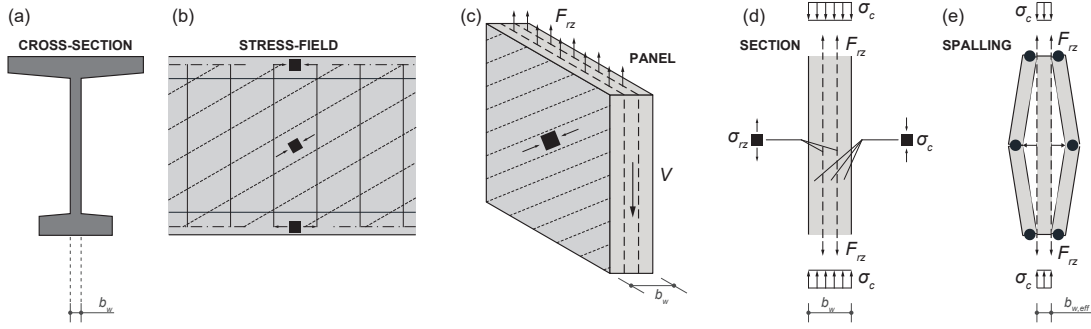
Effective width: (a) cross-section of flanged member; (b) stress-field; (c) web-panel; (d) stresses acting in the web; (e) rupture due to premature spalling of concrete cover.
